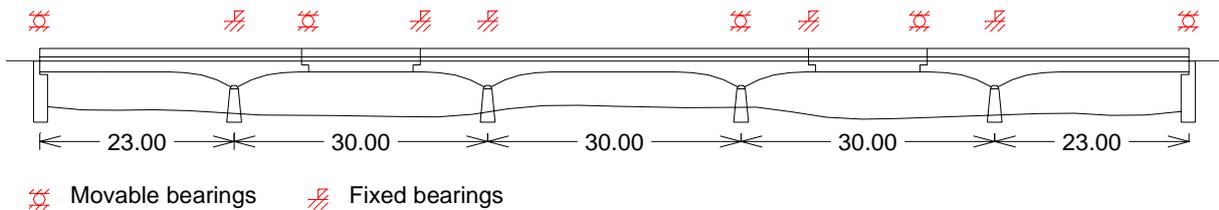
Layout of the Huamani bridge (downstream direction)
